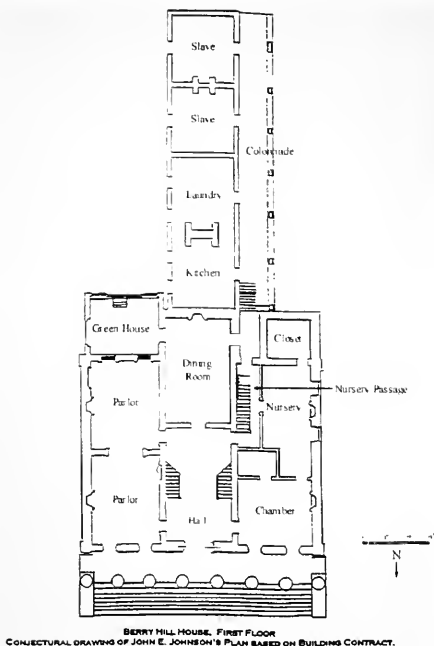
Conjectural plan of Berry Hill Plantation house based on the contract that James C. Bruce made with builder Josiah Dabbs, 1842–1844. *Image created by the author.
